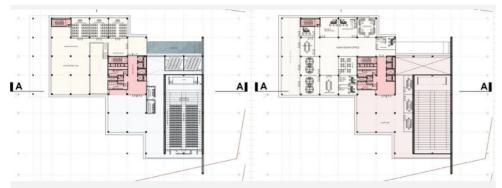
2nd and 3rd floor plan showing the auditorium seating and training spaces.
